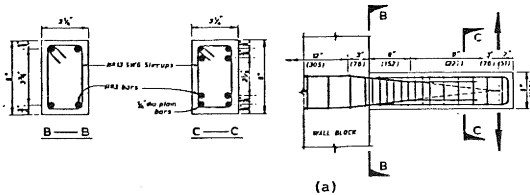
Details of a Diagonally Reinforced Beam-Wall Junction Specimen.
